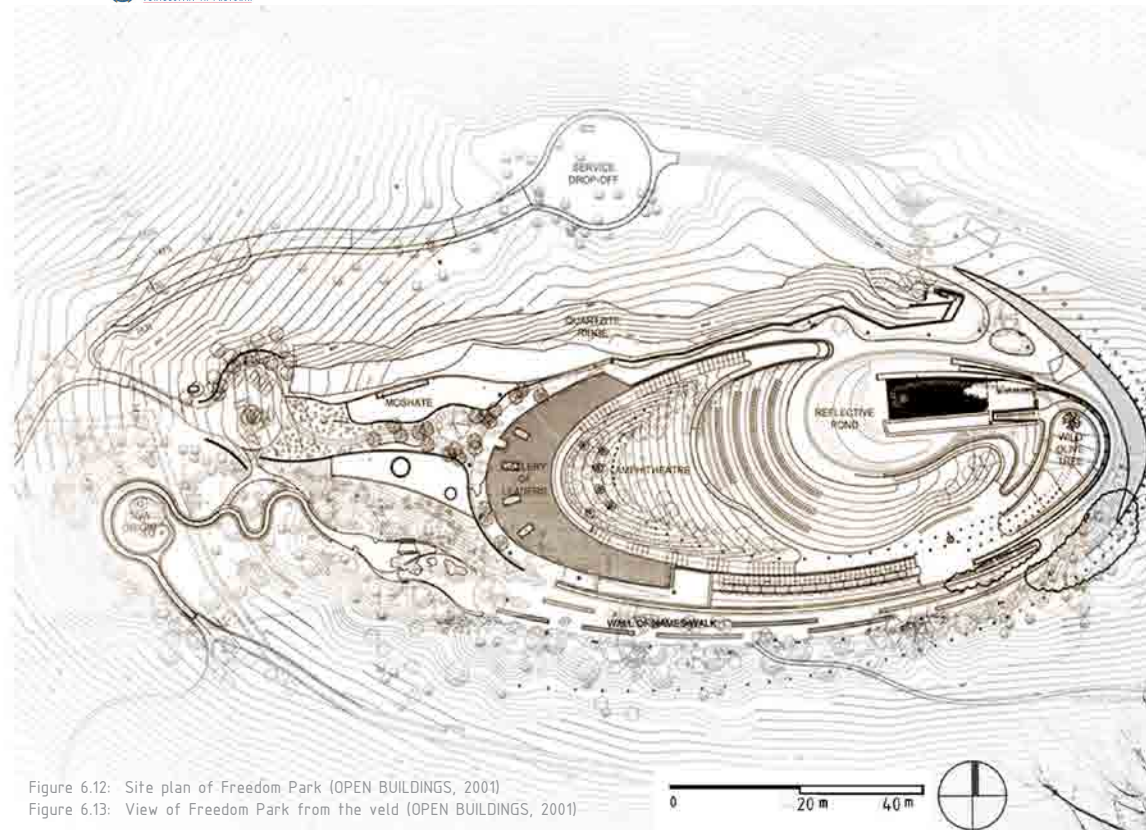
Site plan of Freedom Park (OPEN BUILDINGS, 2001)
